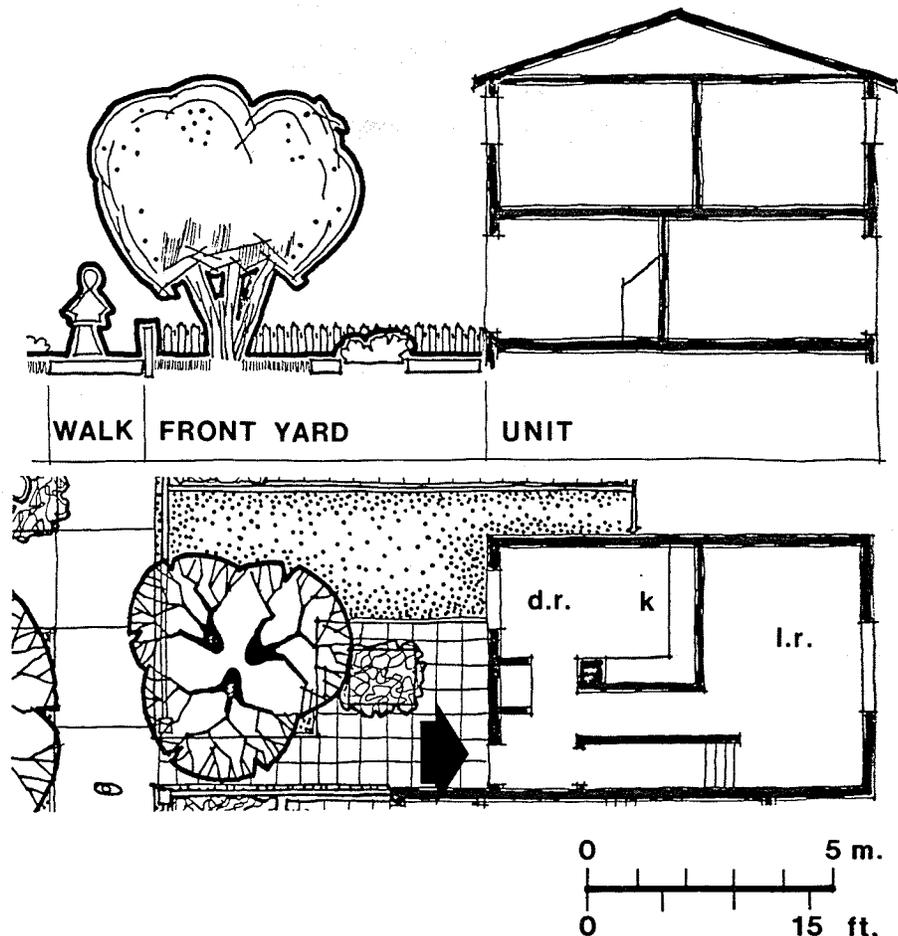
Alternative 3: Detail of Unit and Front Yard
